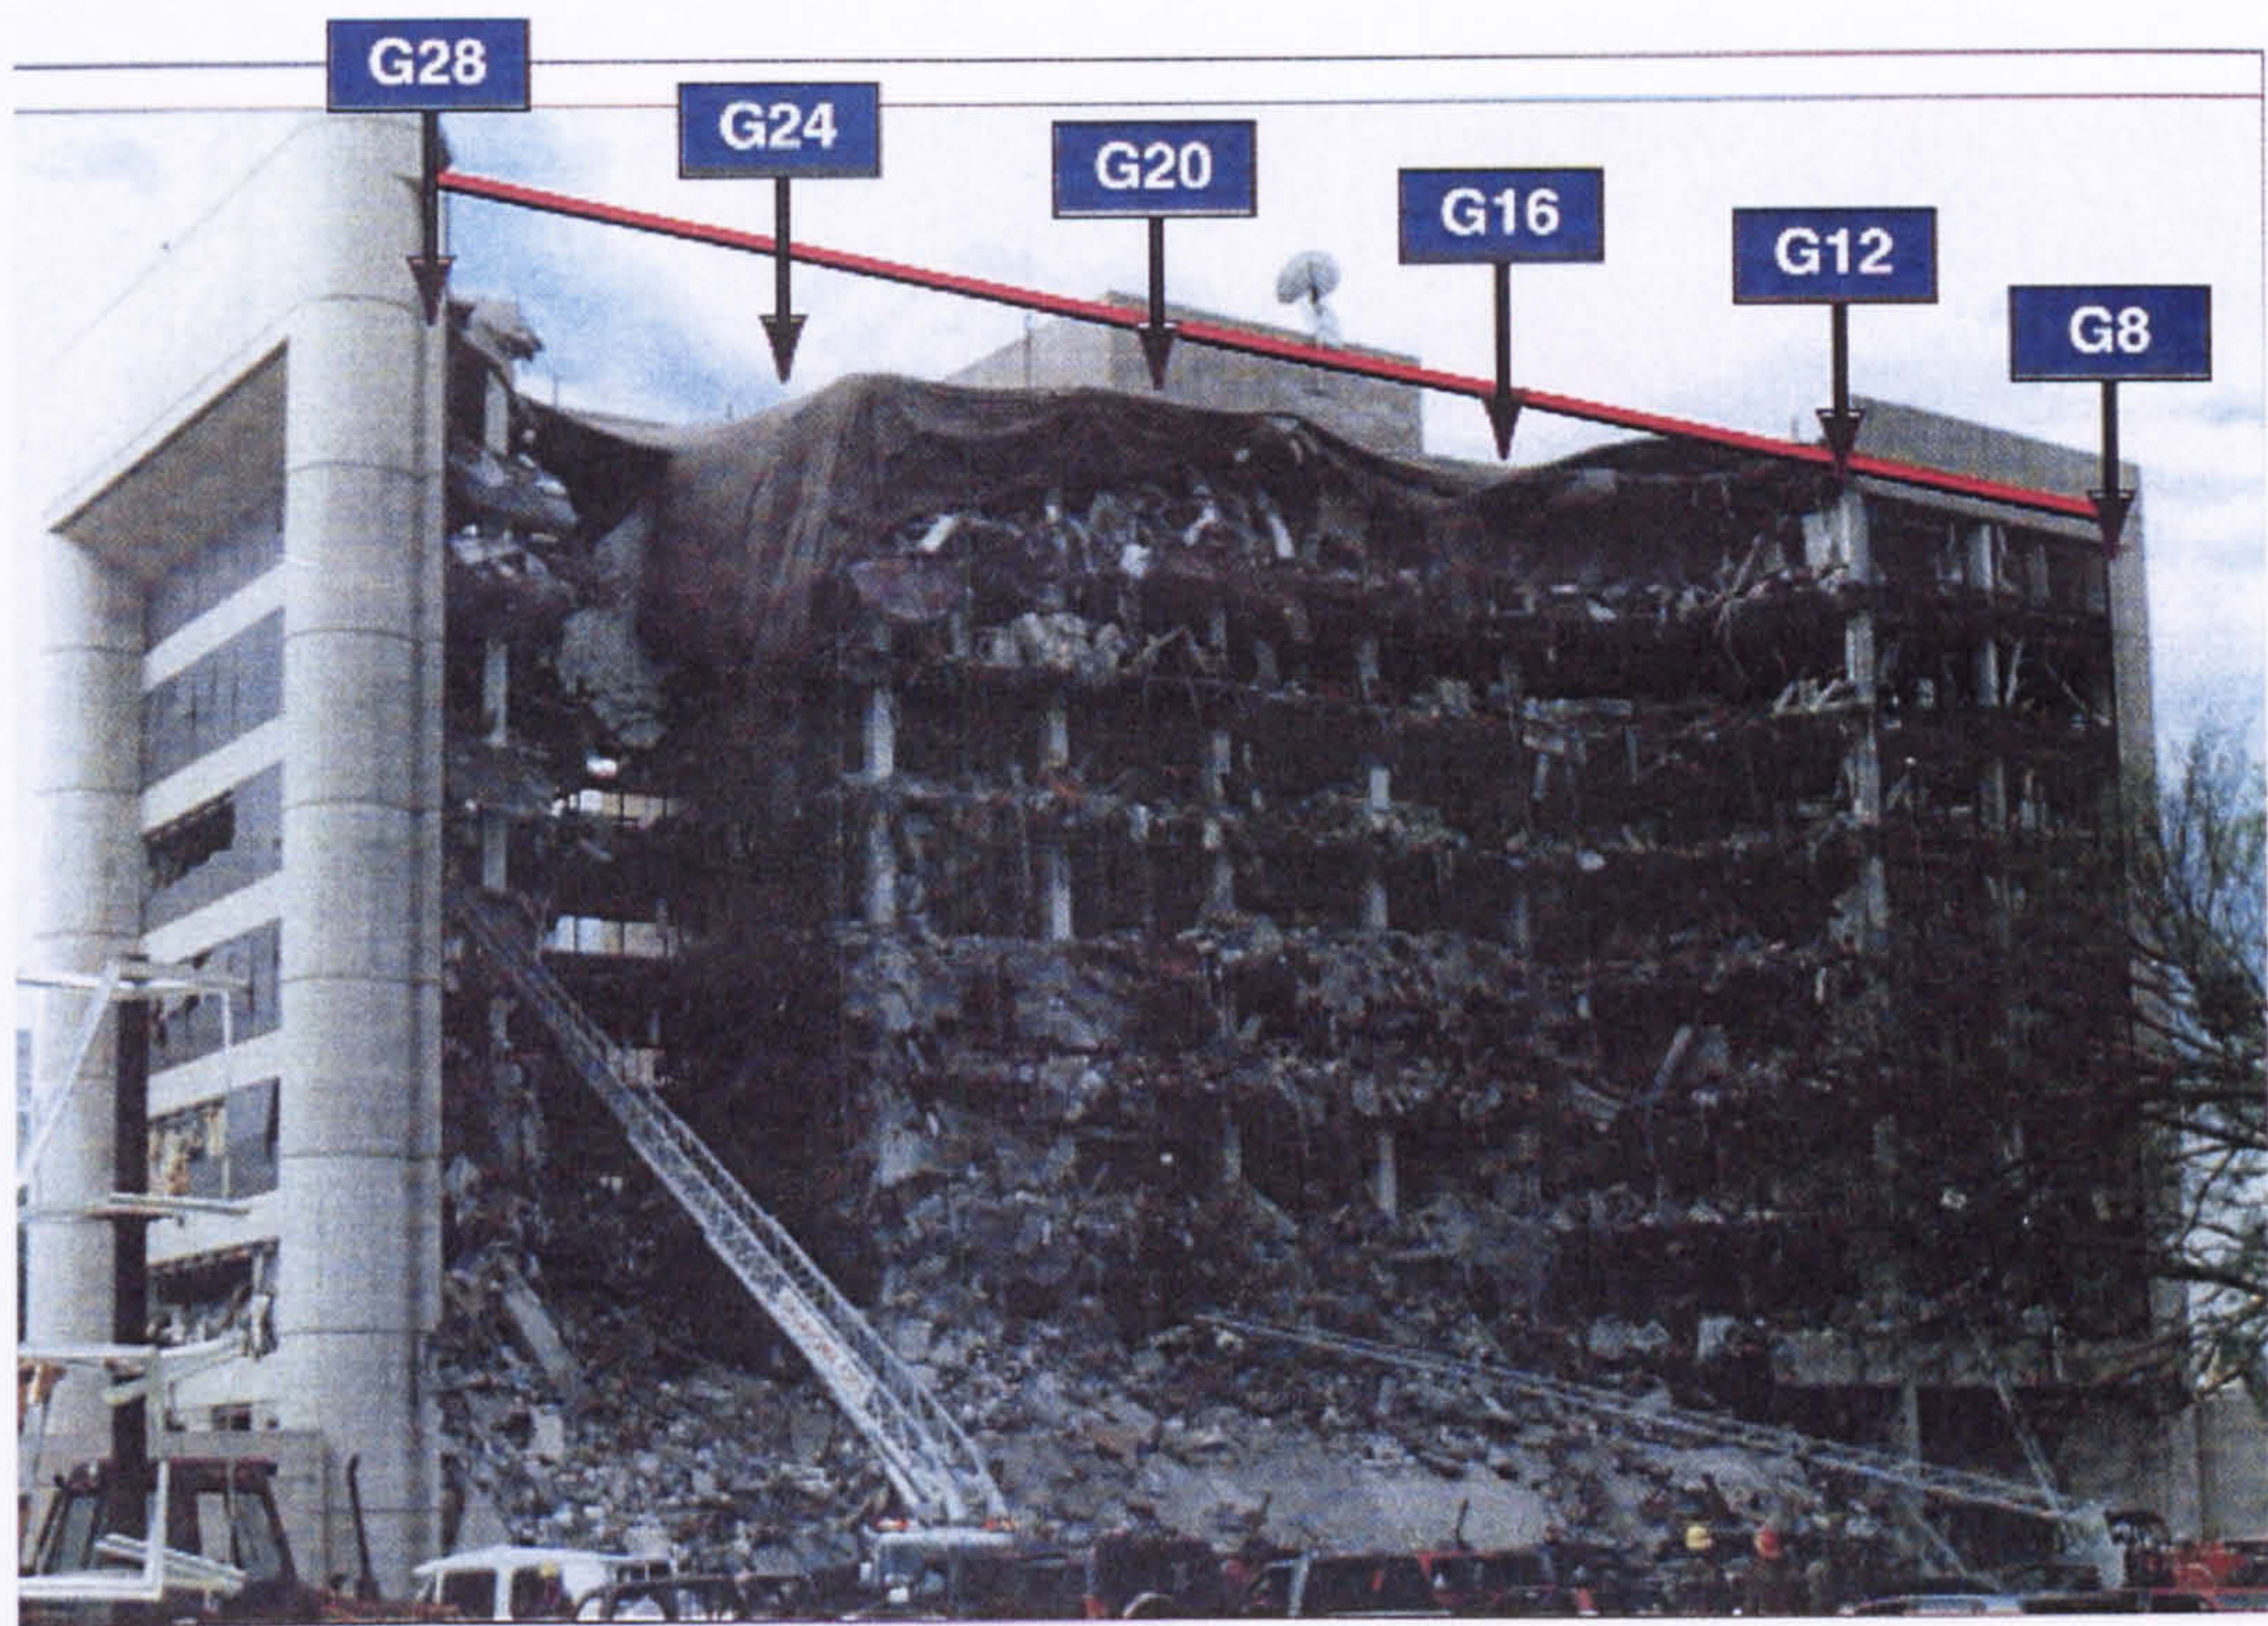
North face columns positions of the Alfred P Murrah building [3]
